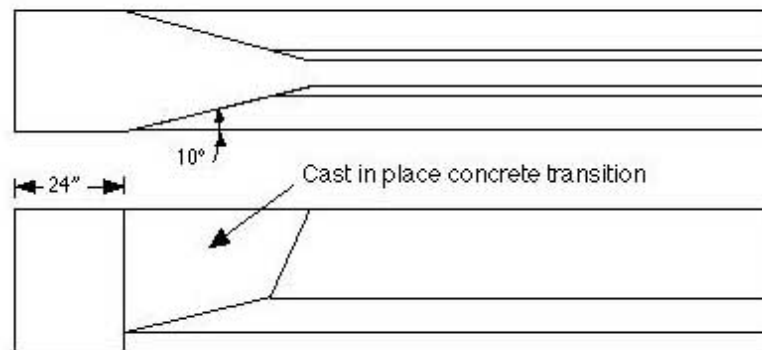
Transition of Concrete Barrier to Vertical Wall.
